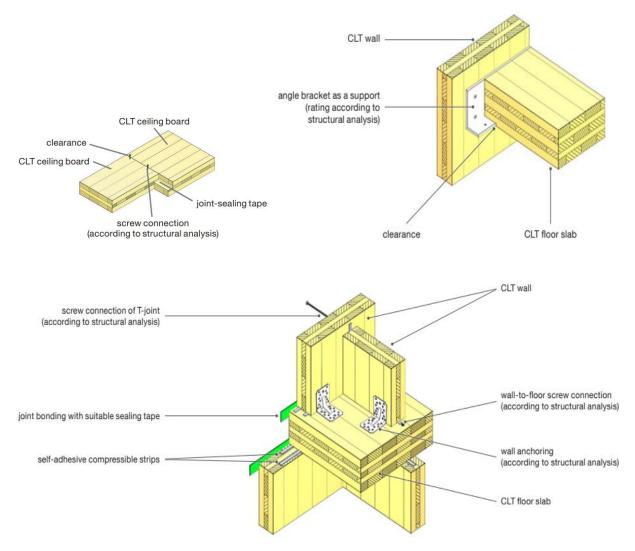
Examples of fasteners used in CLT buildings (Stora Enso, 2017)
